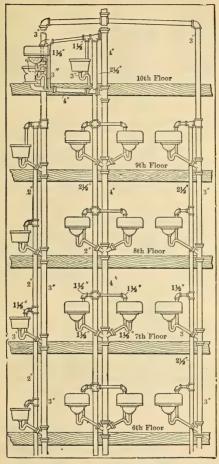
Connections from the Sixth to the Tenth Floor of Hibbs' Building.
